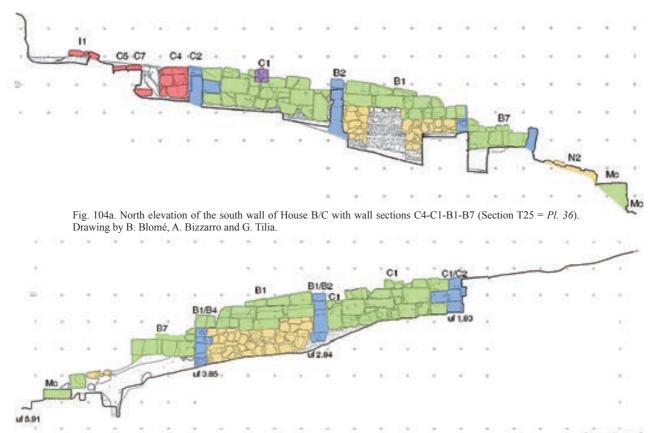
South elevation of the south wall of House B/C with wall sections B7-B1-C1 (Section T26 = *Pl. 37*). Drawing by B. Blomé, A. Bizzarro and G. Tilia.
